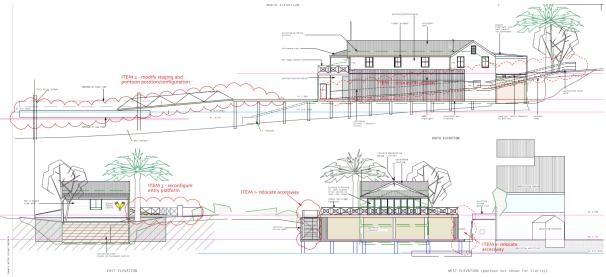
South, East and West Elevations indicating access ramp and pontoon at Balmain Rowing Club.
